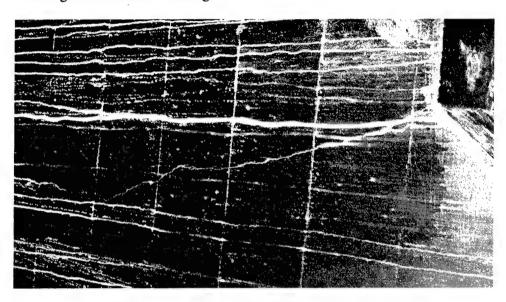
Transverse cracks in the bottom slab of the broken pontoons
